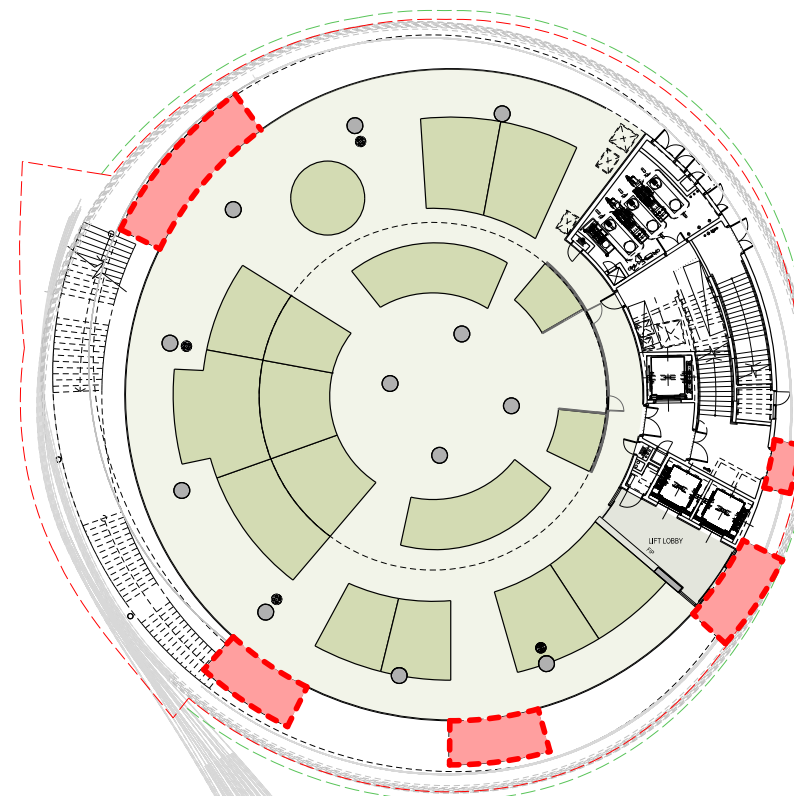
Proposed Ground Floor Plan - awnings above highlighted in red
